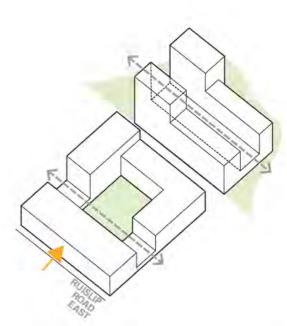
Breaks occur in buildings facing East and West. This does not maximise view of the trees in
